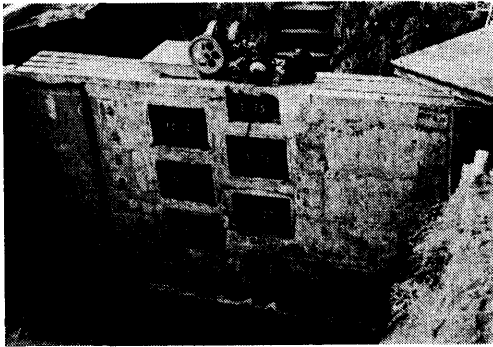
Pressure cells fixed on the vertical surface of the wall, backfill sand being removed
